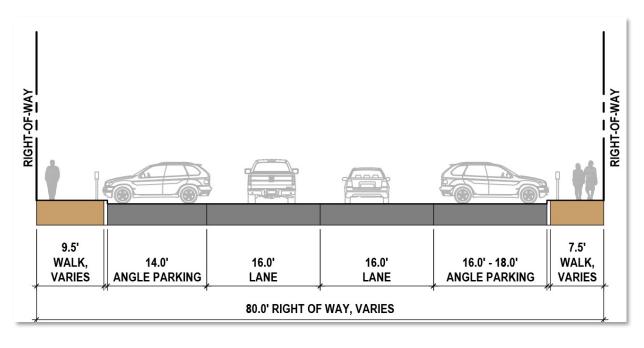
5th St - Existing Cross-Sections Between Rood Ave & Grand Ave
